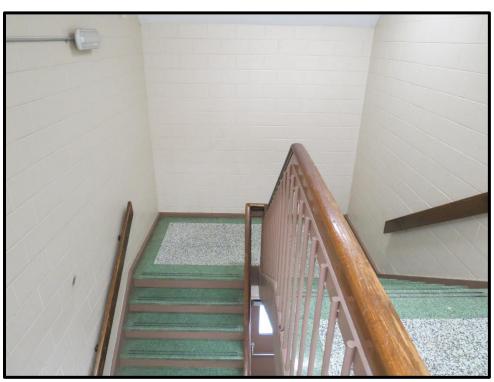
Stairwell - West Wing (Photo taken on March 13, 2019)
